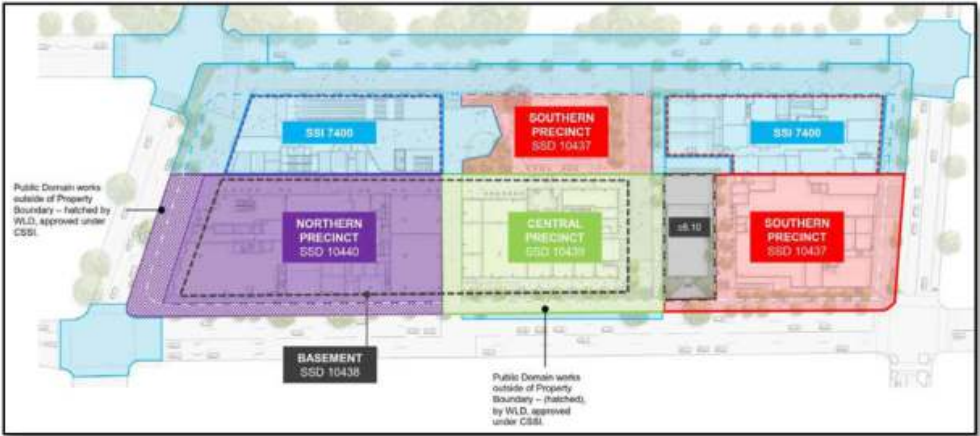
Plan of Waterloo Metro Quarter Precincts (Source: SSD 10437 EIS)
